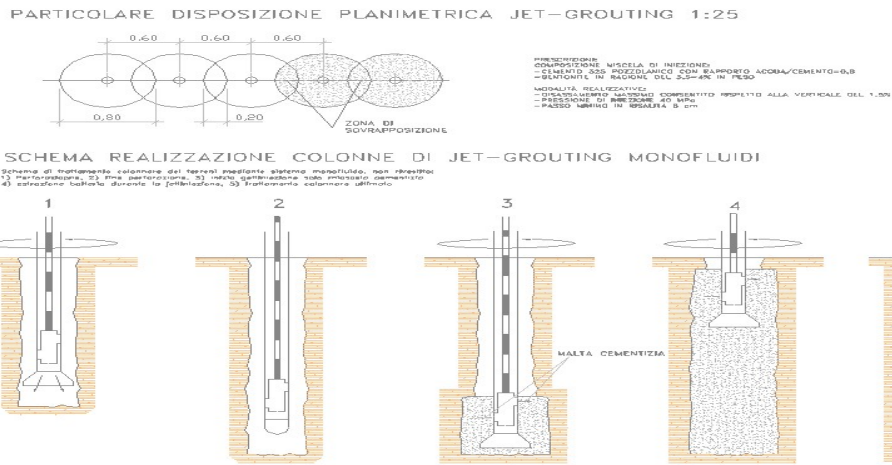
Jet-grouting technique for bentonite-cement sheet pile installation.
